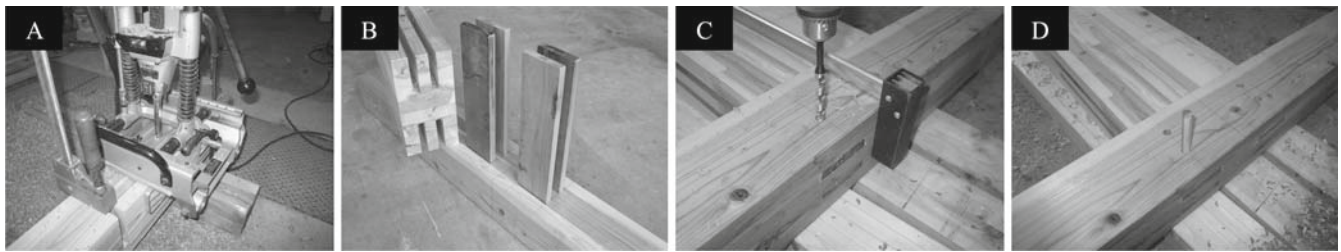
Making and assembling process for column-beam joint: cutting (A), assembling (B); making hole (C); inserting dowel (D)
